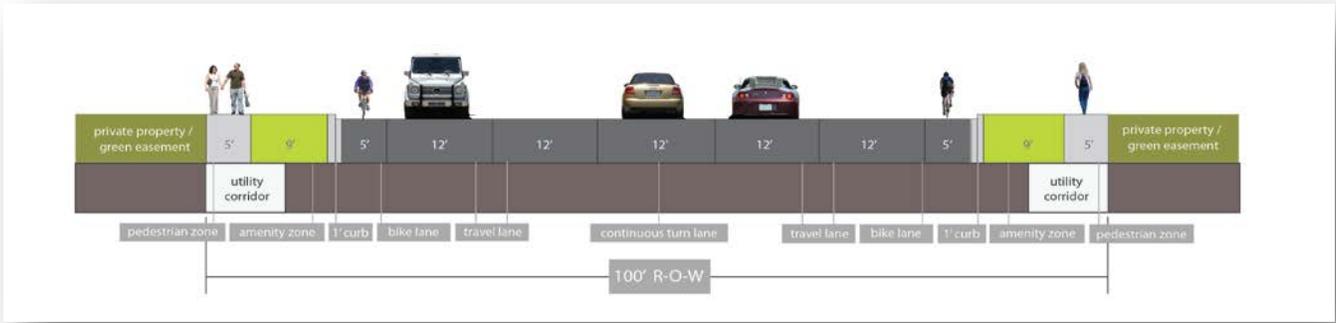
Improved Street Section – 100' - US 50 Highway to Russell Street
